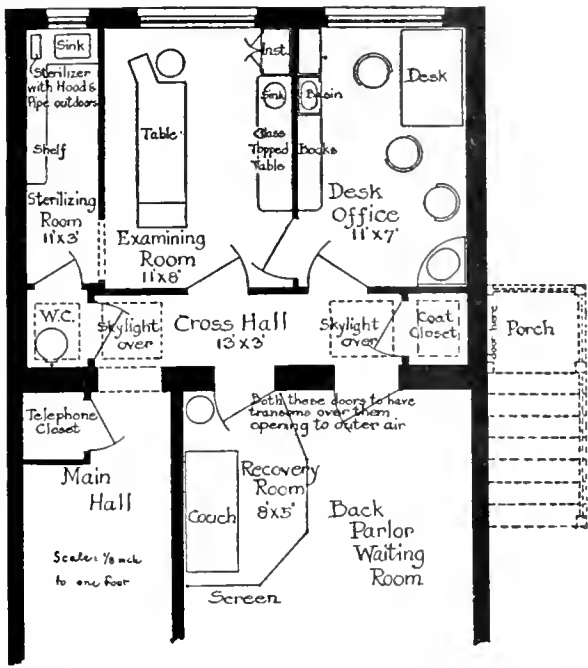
Extension on ordinary 20-ft. house. Extension roof is lower than ceiling of waiting room, and transoms light the waiting room. This is a flexible plan, because back parlor can be used as a second examining room if desired, putting waiting patients into the front parlor, either regularly or on occasion. These sizes are all minimum, as 7x11 for desk office is the bigness of a ball bedroom. The plumbing is scattered. The table would stand close to the wall. For a 25 or 30 foot house this arrangement is a good one. For a corner house, or a country house with side entrance, the vestibule will replace the coat closet on this floor.
